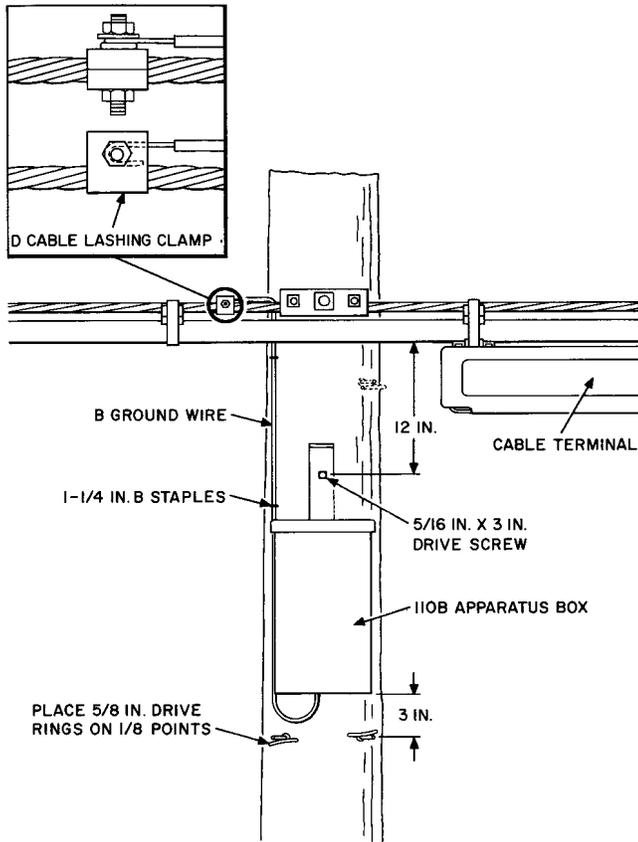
Installing 110B Apparatus Box at Strand Mounted Terminal Location
